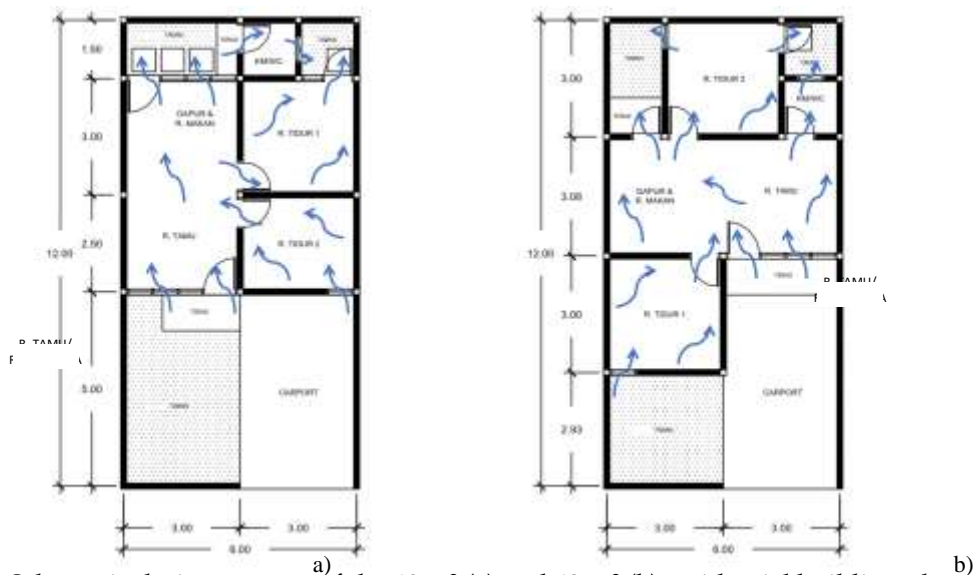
Schematic design concept of the 40 m² (a) and 43 m² (b) residential building plans
